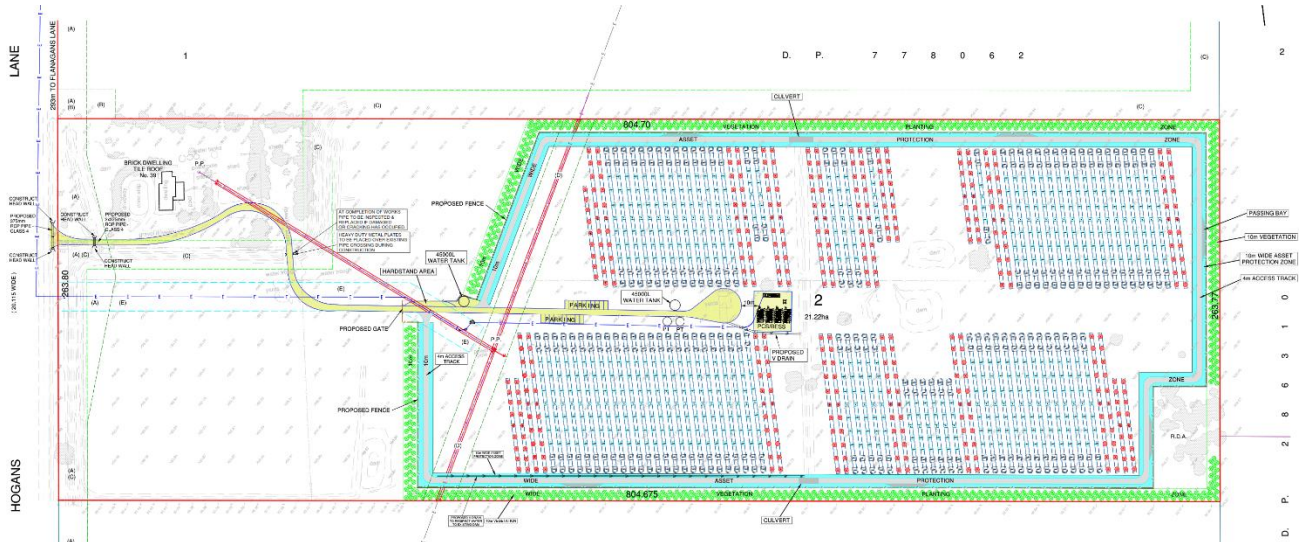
Overall Site Plan - 4.95MW Deniliquin Solar Farm
